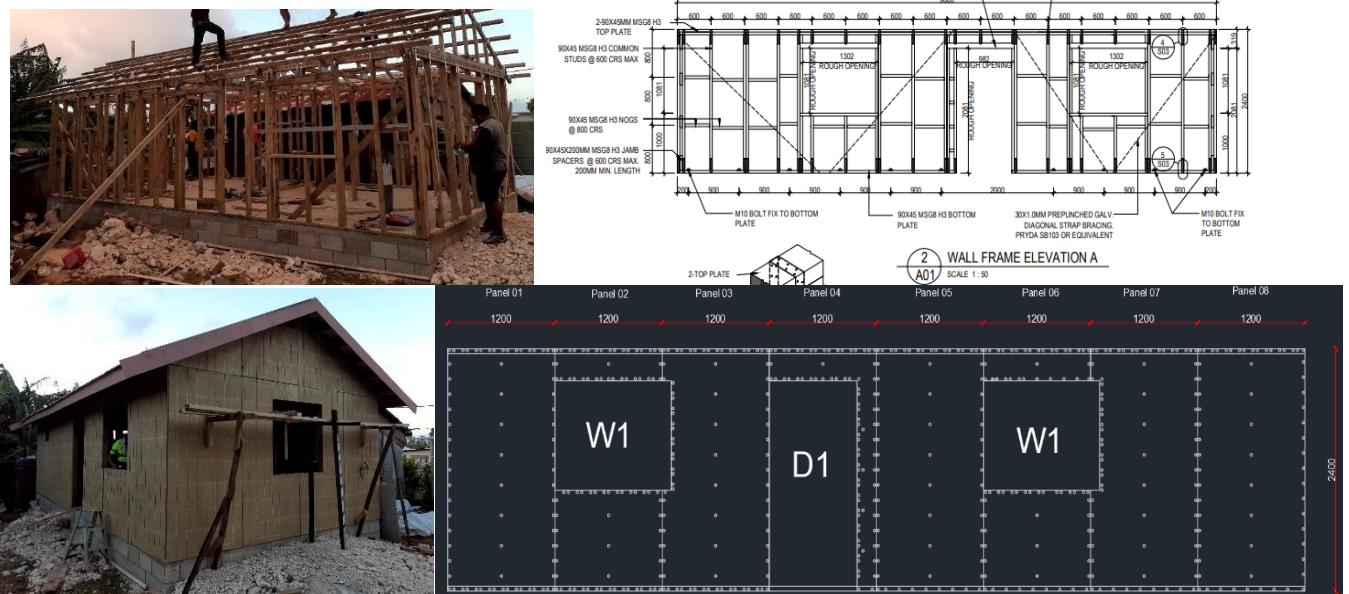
Shear walls from timber framed to bracing and nailed connections to timber panels
